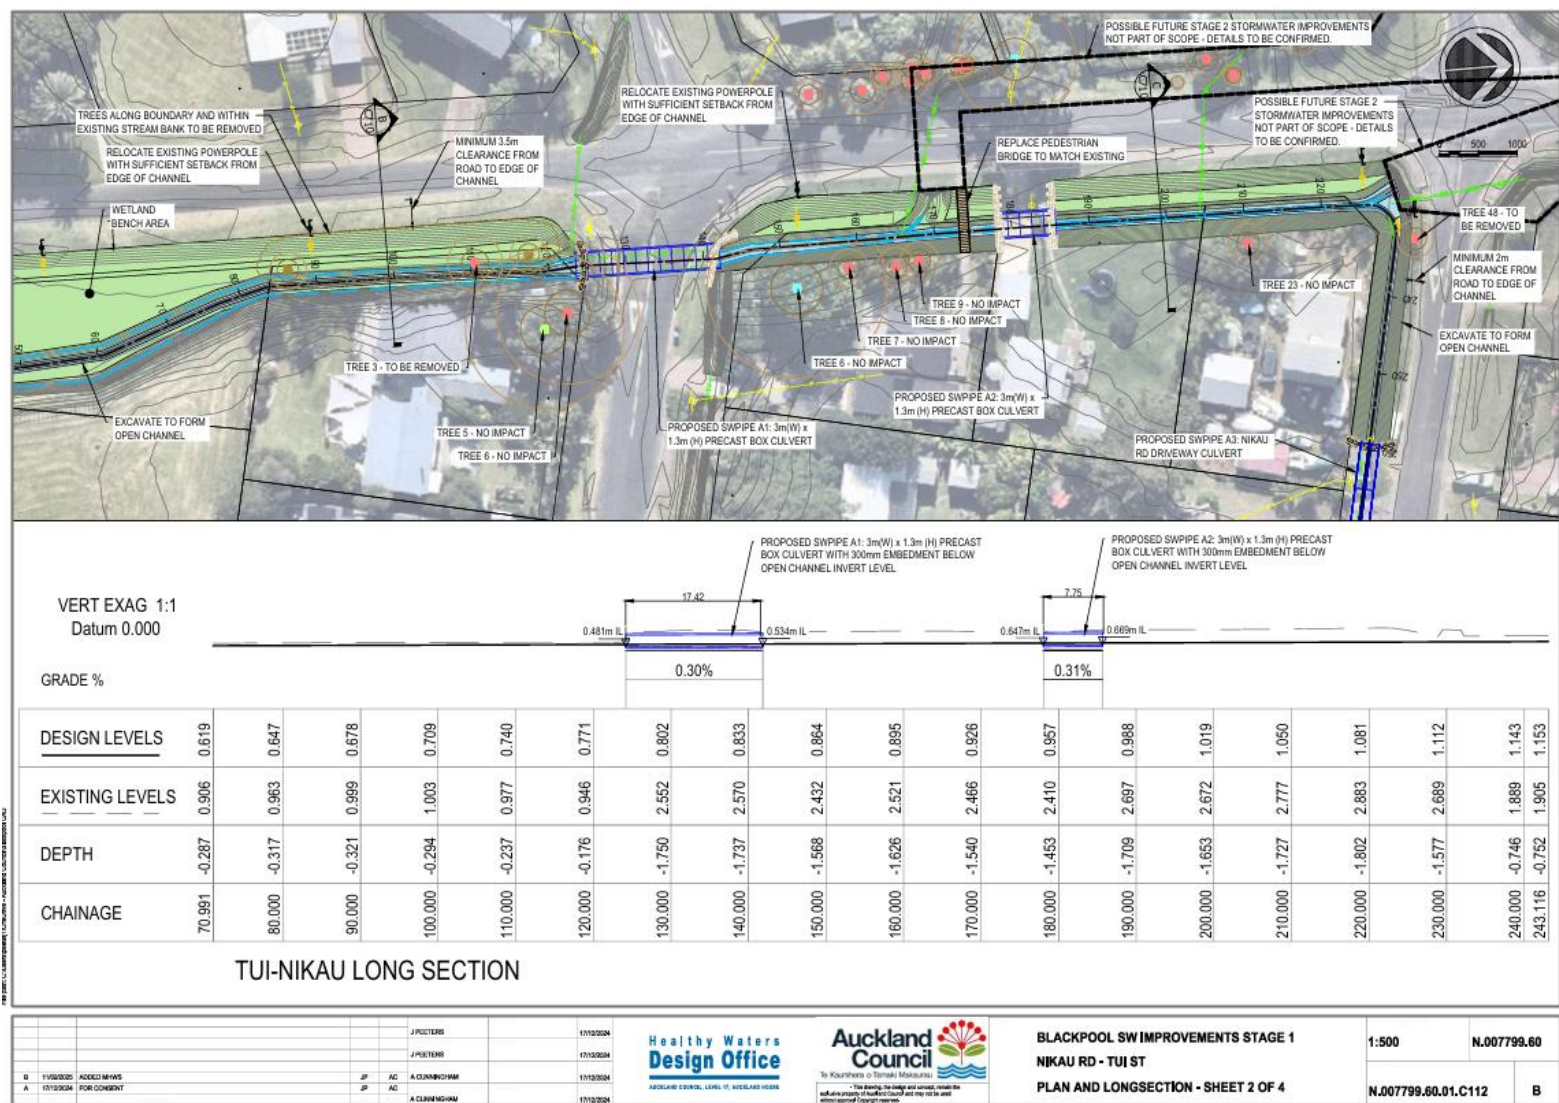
Blackpool SW Improvements Stage 1 Nikau Rd – Tui St Plan and Longsection – Sheet 2 of 4
